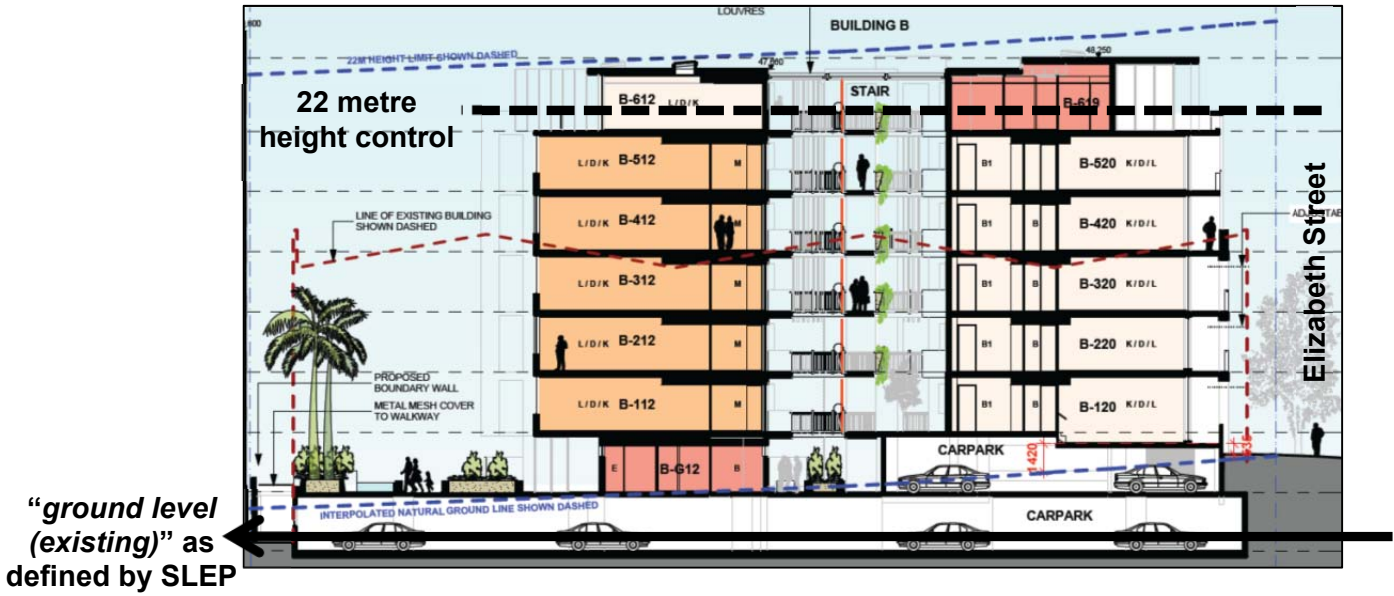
East-West section of Building B illustrating the location of existing ground level on site and the technical breach to the building height development standard
